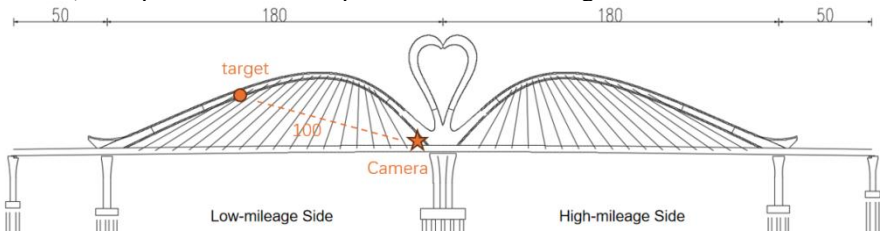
Overall Elevation Plan of the Main Bridge (m)
